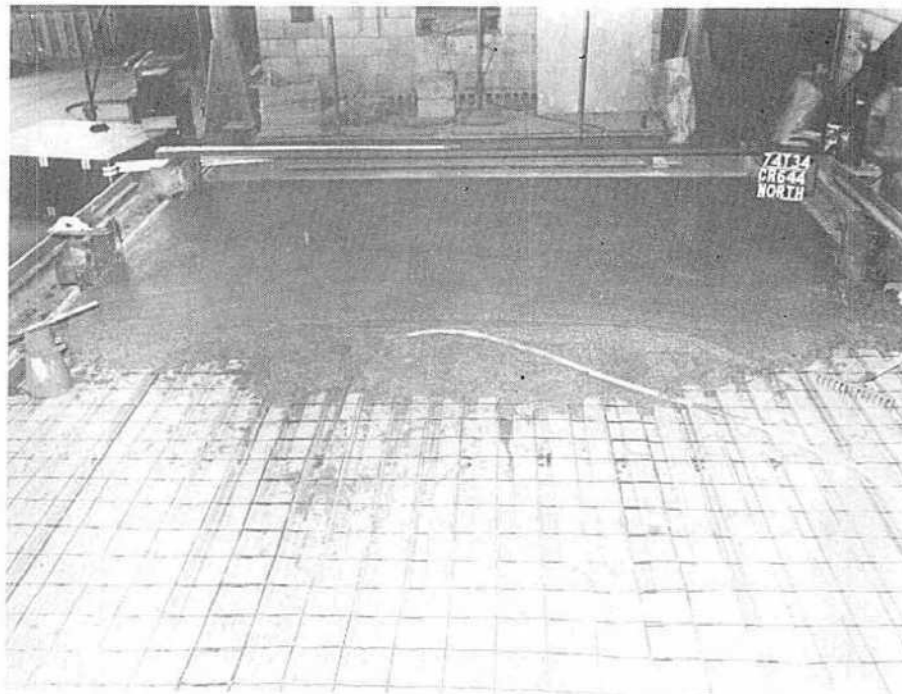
CONCRETE TOPPING BEING PLACED ON TYPICAL
